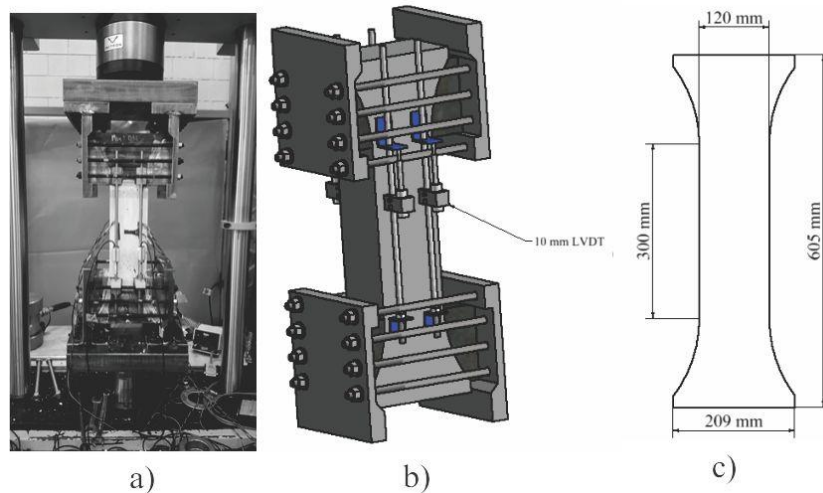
Direct tension test set-up; a) photograph; b) 3D-model; c) elevation
